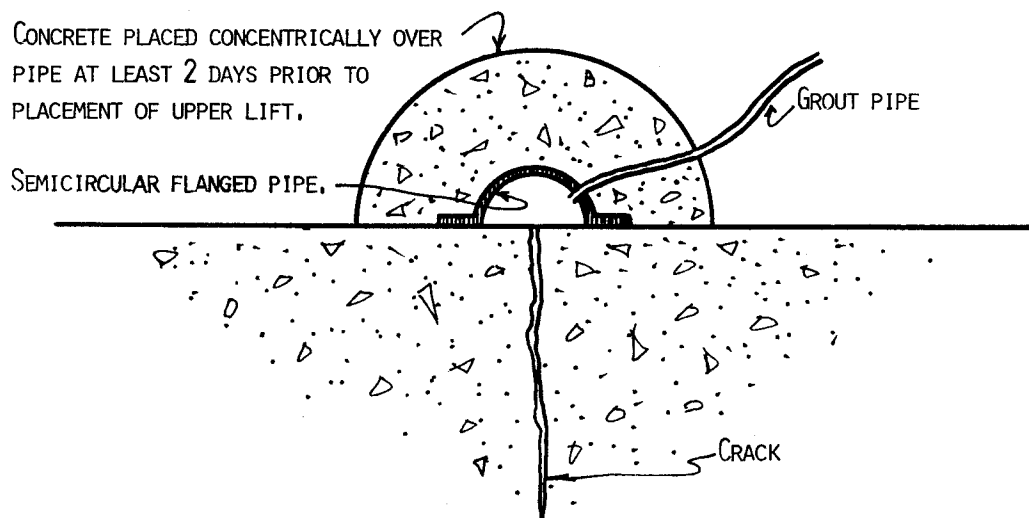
Repair of crack using the crack arrest method (ACI Committee 224, 1984).
